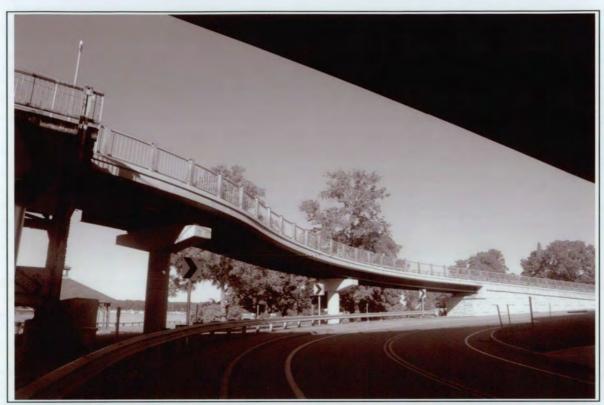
Description: GSB north approach, I-girder section as seen from Hilton Drive Reference (file name or frame#): DOV0158\_4 Direction: W
